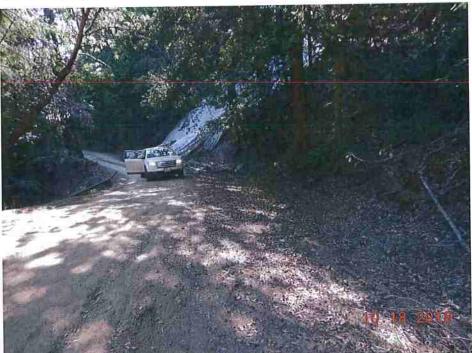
RP12. Facing south. Repair slide, pull material out of road way and stabilize failed slope.
